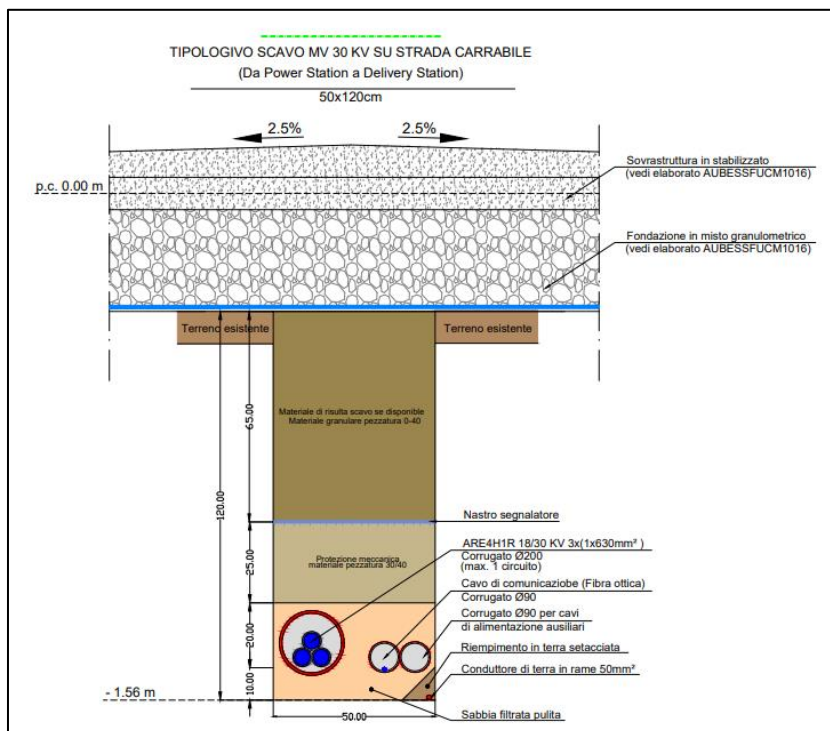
Extract of table "Layout plant: excavations planimetry"
